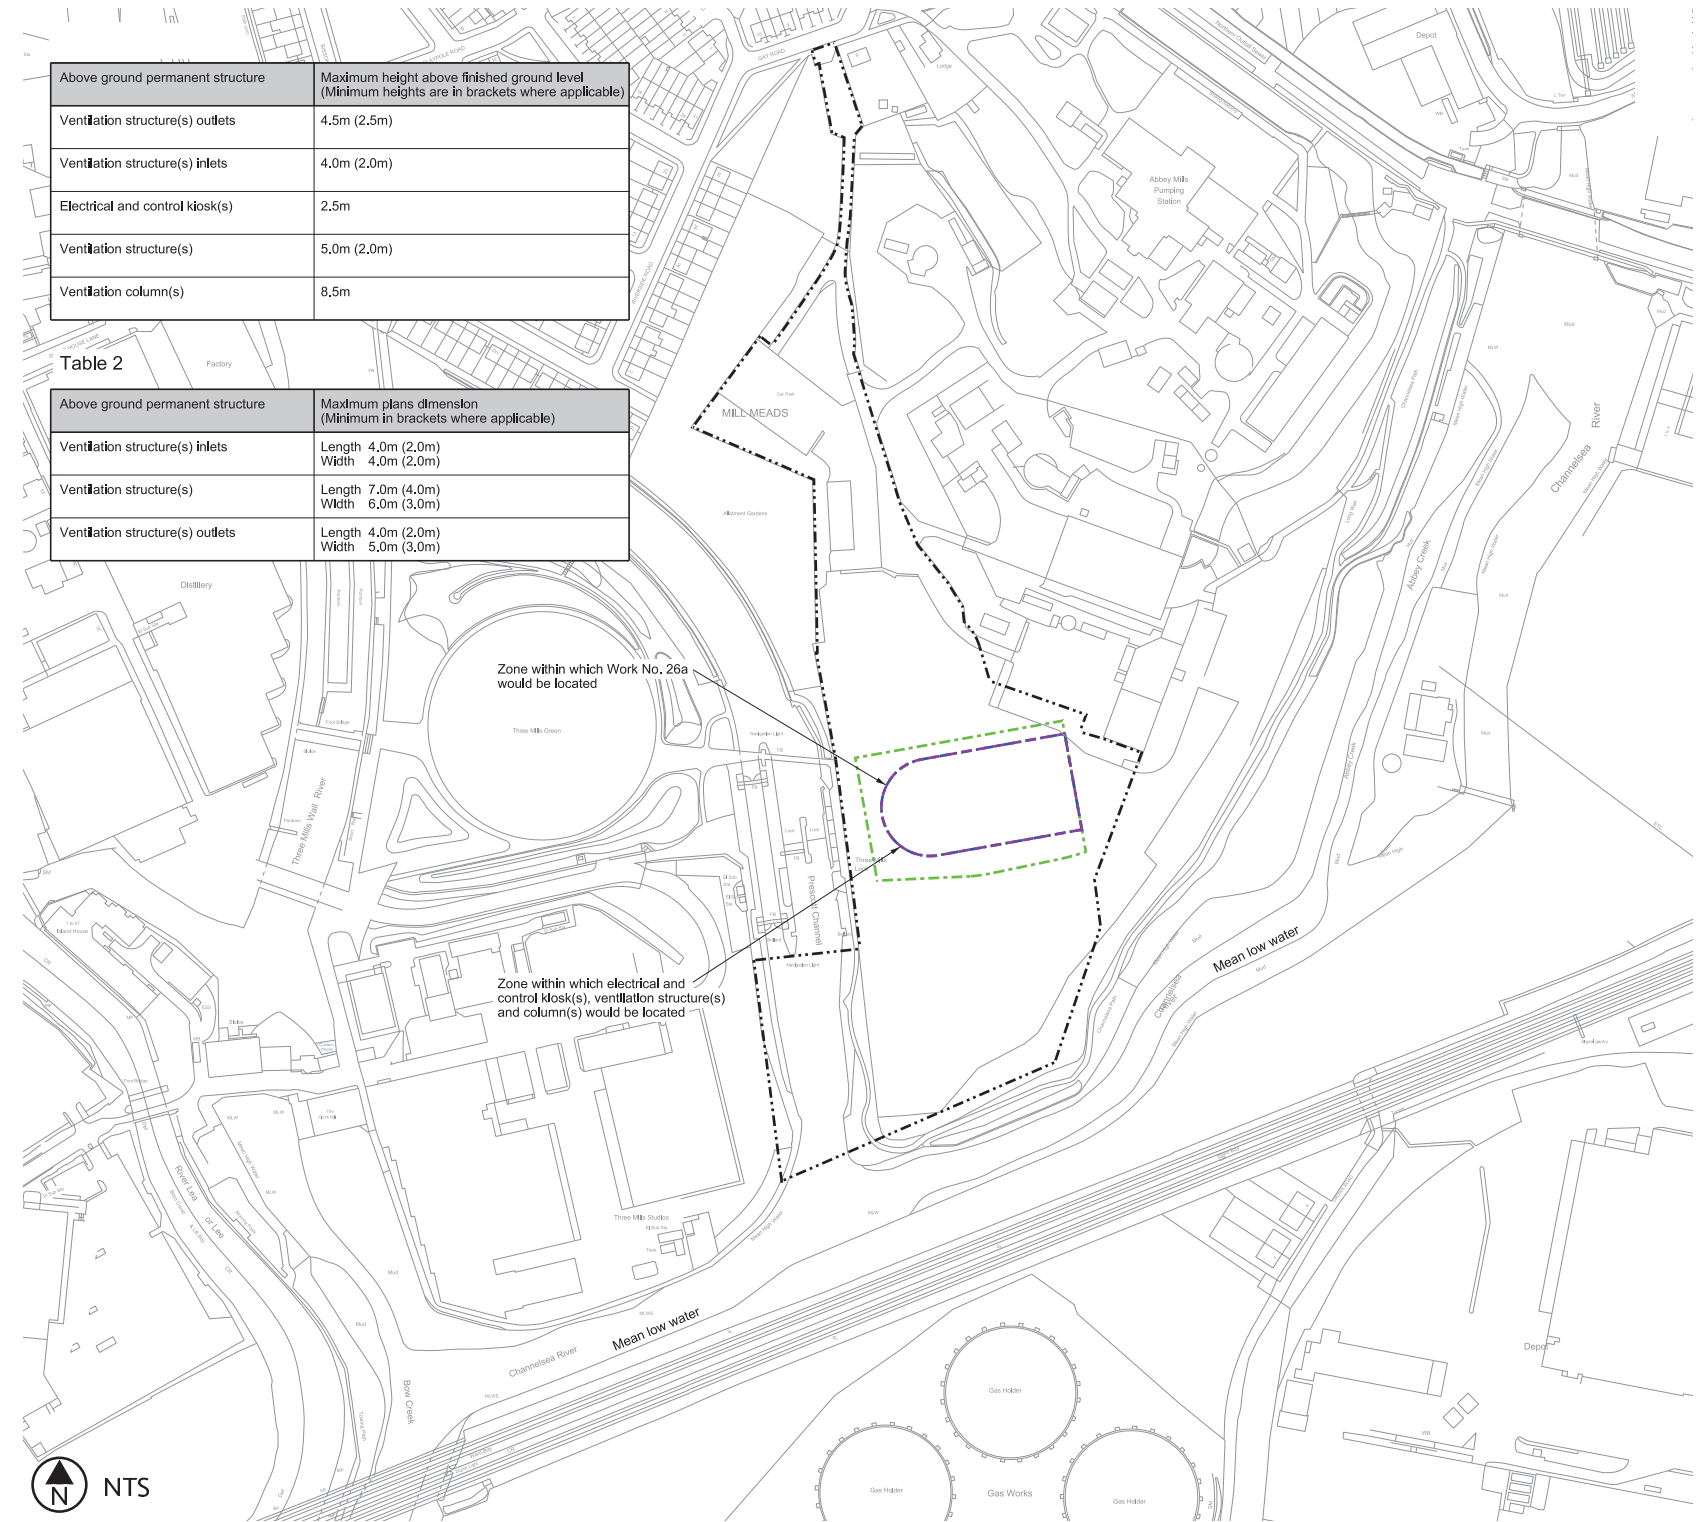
Site works parameter plan - refer to Site works parameter plan in the *Book of Plans
